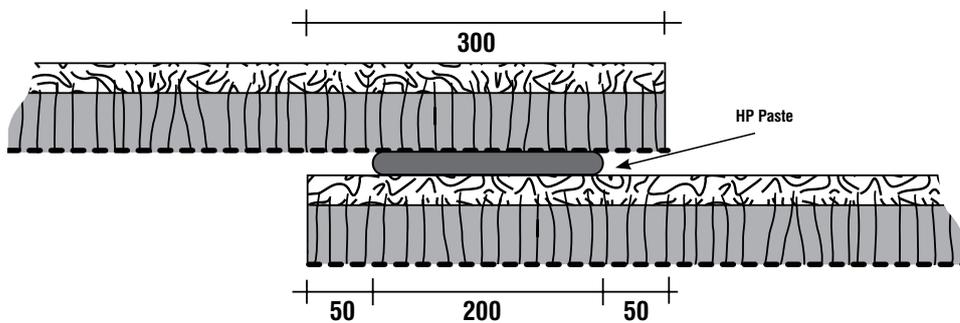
Transverse (end) overlap cross section (X1000 shown)
